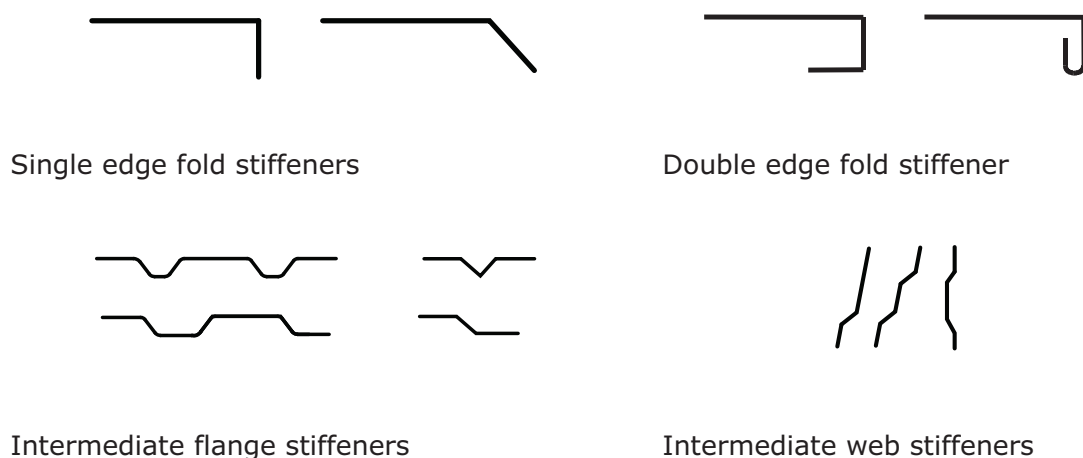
Typical forms of stiffeners for cold-formed members and sheeting
